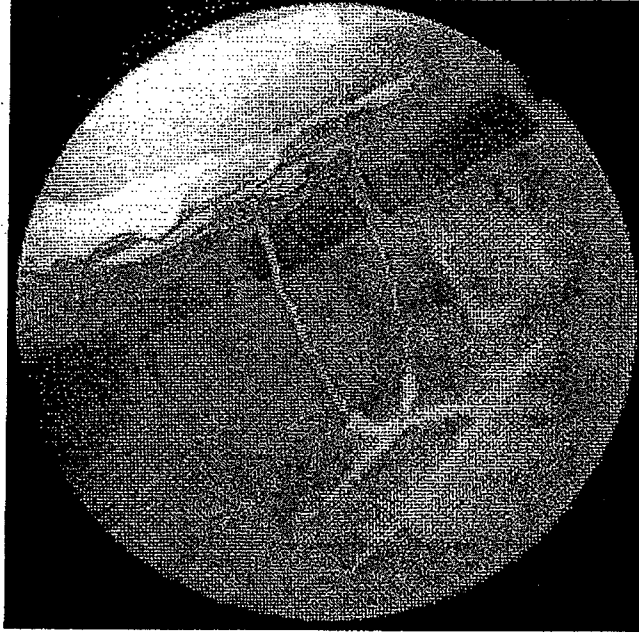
Brickwork - Disengaged and corroded brick tie.
